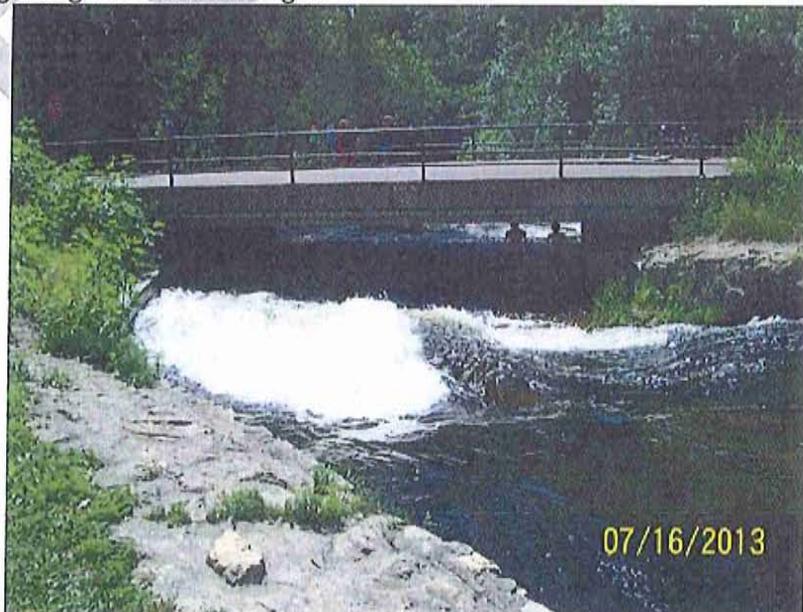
54th Street Bridge Looking South at Minnehaha Creek
